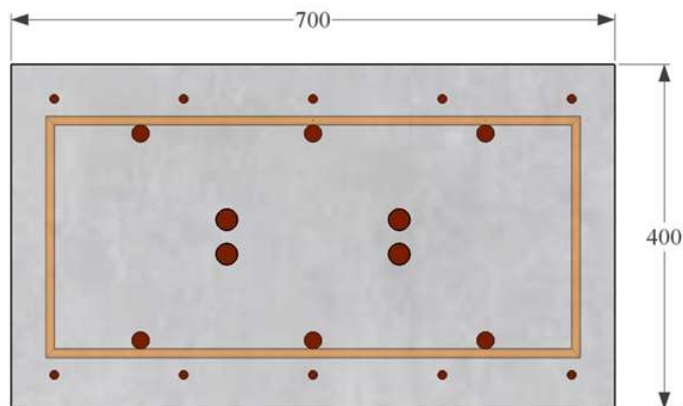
Geometry of the modelled parapet element without additional transverse reinforcement (Units: mm)[16]
